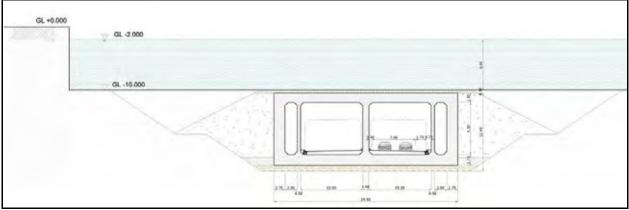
TYPICAL CROSS SECTION OF IMMERSED TUNNEL
